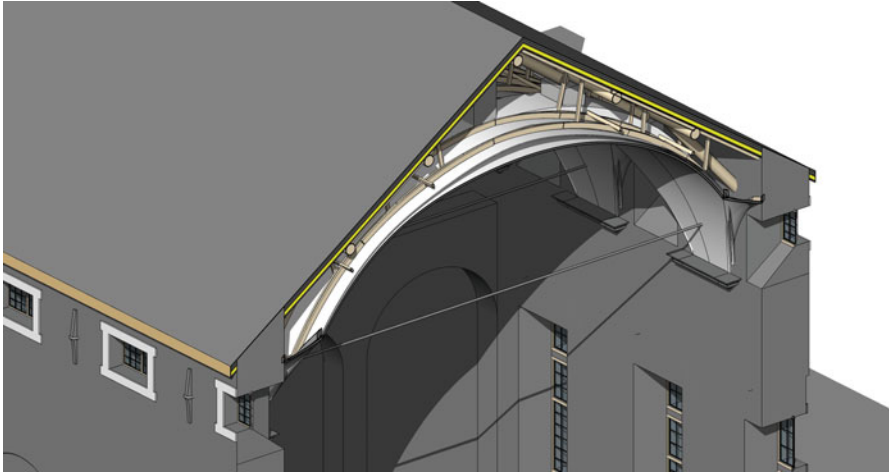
Thermal improvement of the roof (BIM model, Babbetto, R. 2015)
